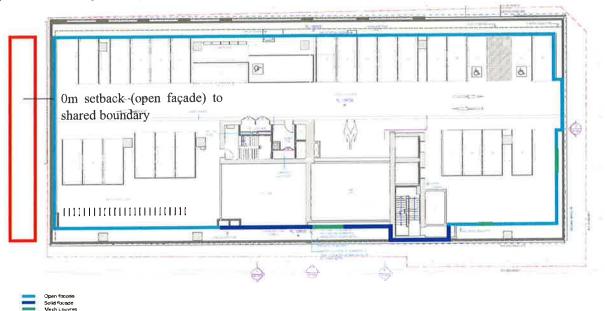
Proposed open air above ground car parking level of Site B with nil setback to the south
